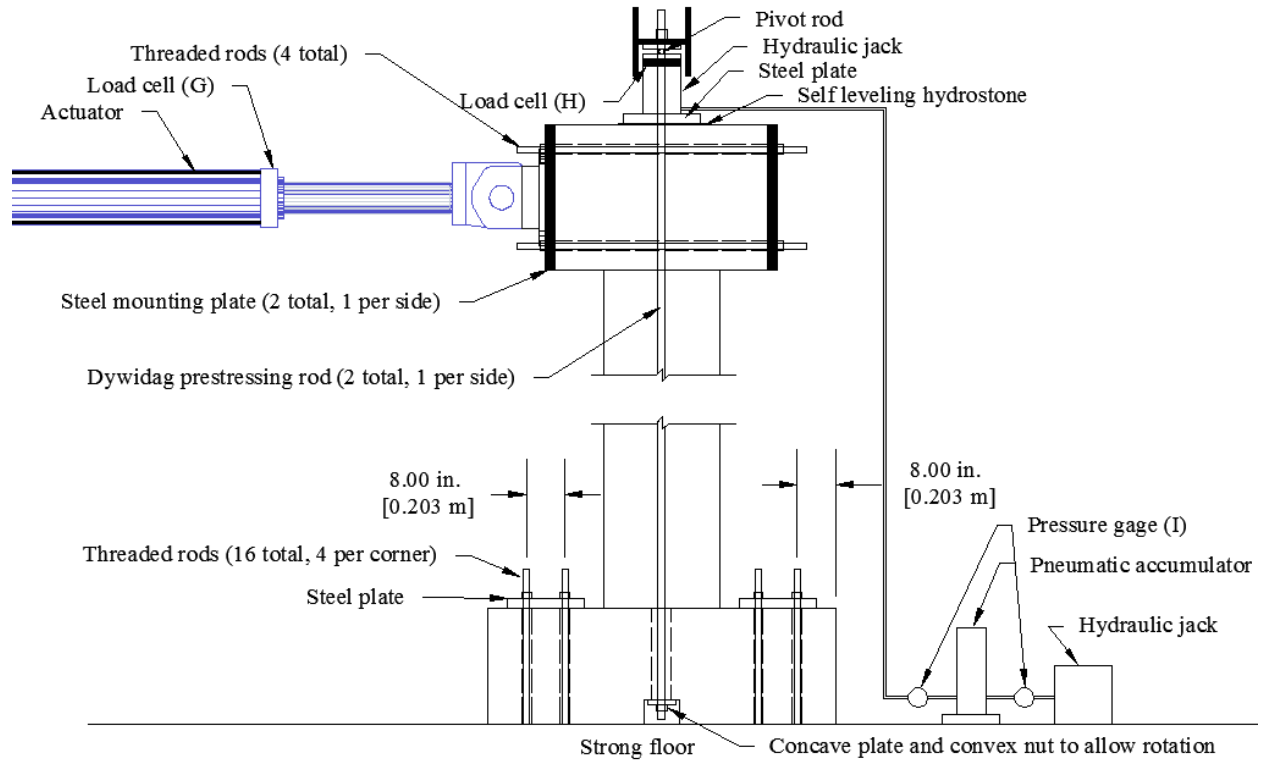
Column C1, C2, C3 and C4 east elevation view of test setup
